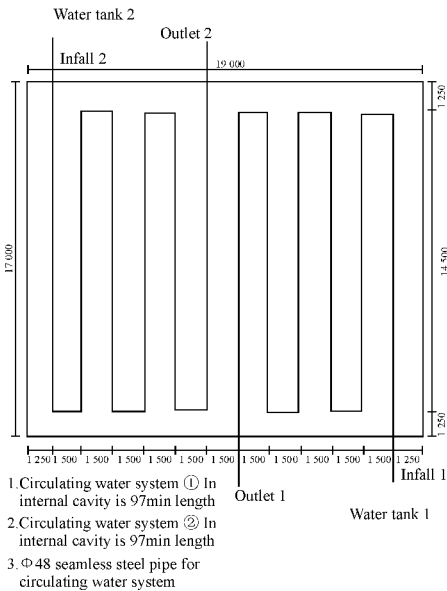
Circulating water cooling pipe plan at -4.65 m
